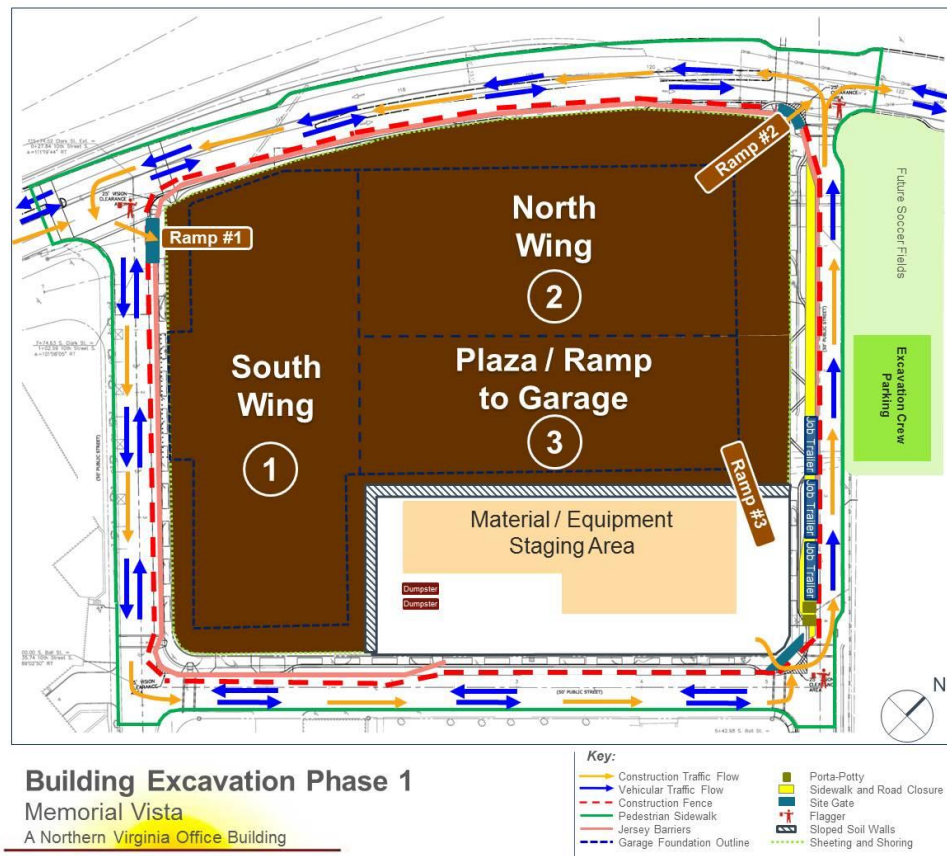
Building Excavation Phase Site Plan (Original Drawing Underlay Courtesy of Gensler)
